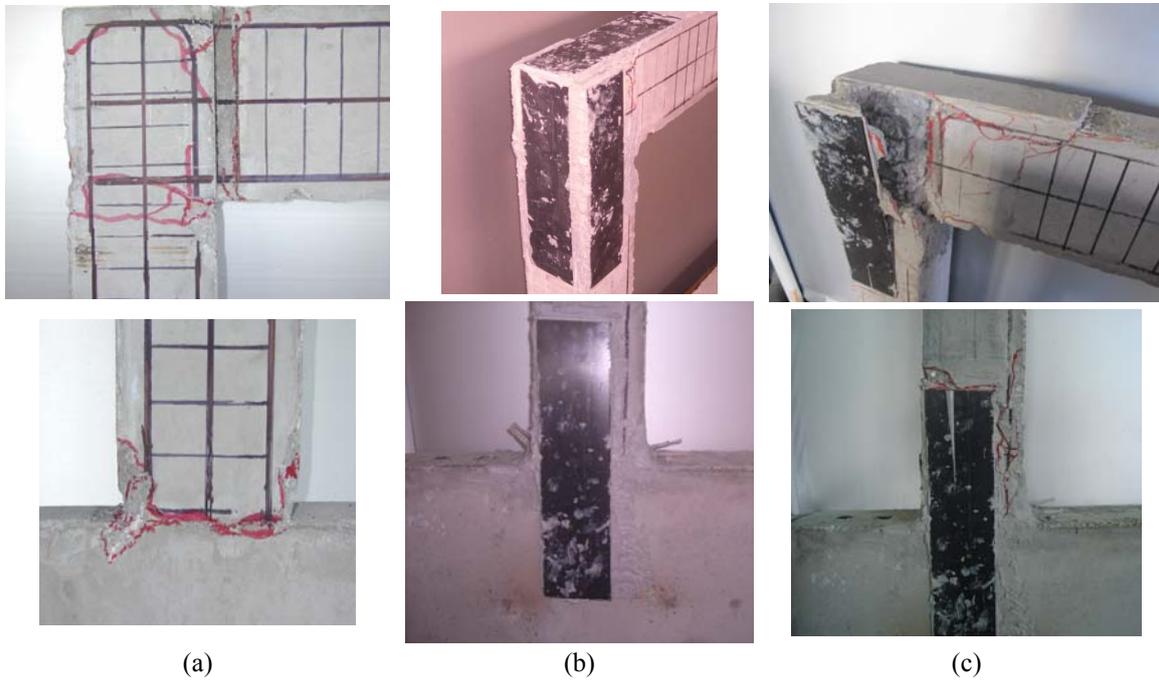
(a) Joint regions cracking configuration of original specimen B; (b) The applied repair procedure with strips; (c) Joint regions cracking configuration of repaired specimen RB
